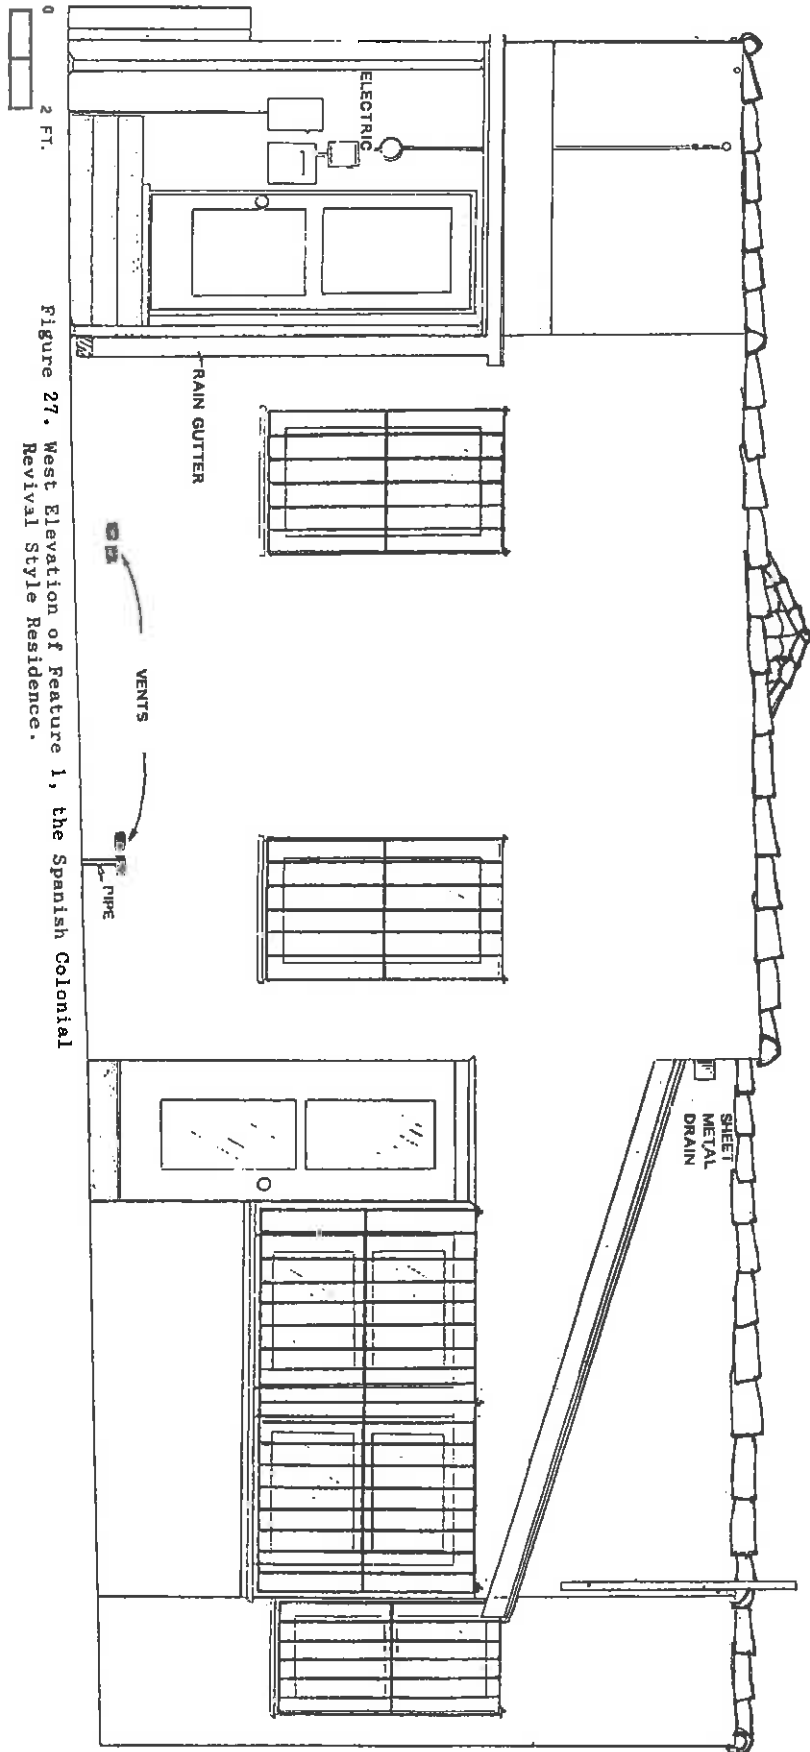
West Elevation of Feature 1, the Spanish Colonial Revival Style Residence.
